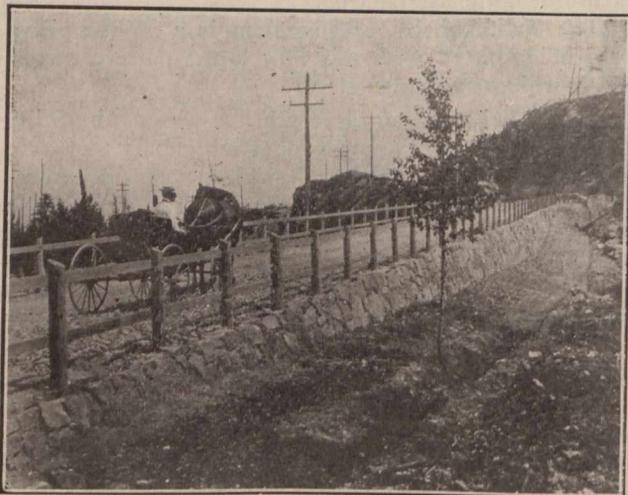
Cobalt-Haileybury Road, Showing Permanent Wall Construction.
